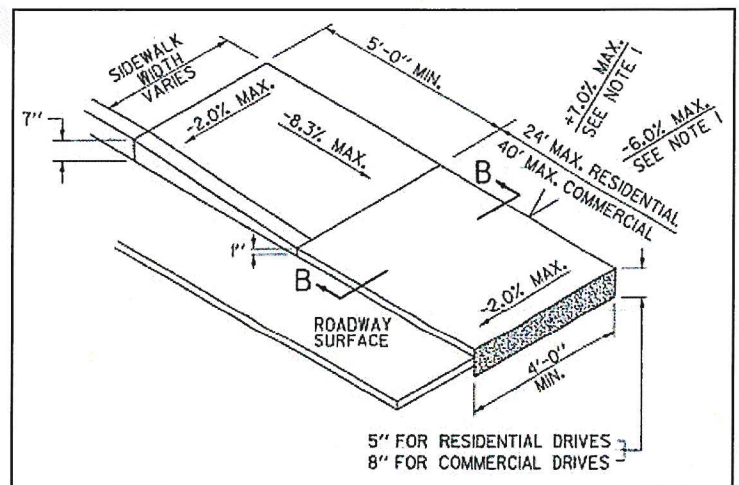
Parallel crossings should only be used on driveways that slope downhill from the street and care should be taken to avoid excessive cross slopes.
